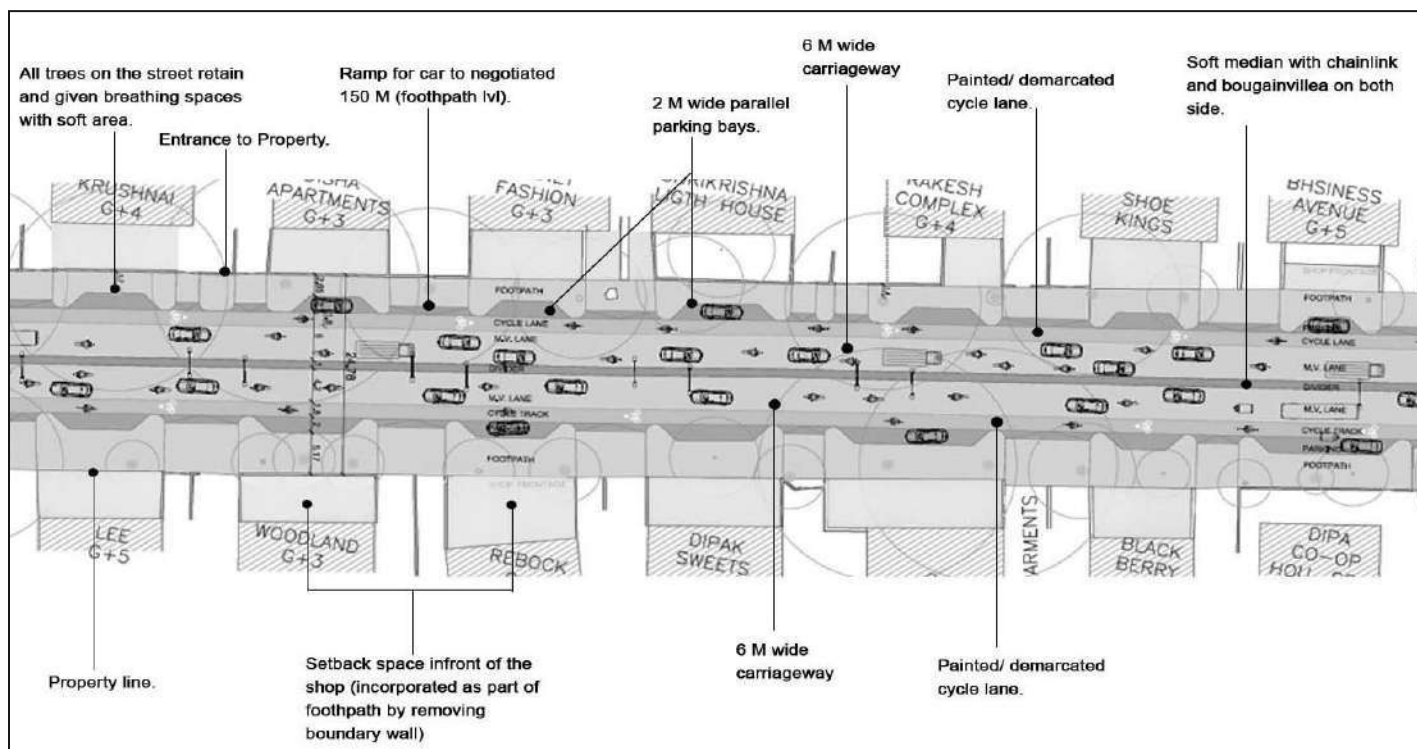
Sample of Detailed Layout Drawing Showing Various Elements for the Urban Street Project with 30 m Wide ROW
